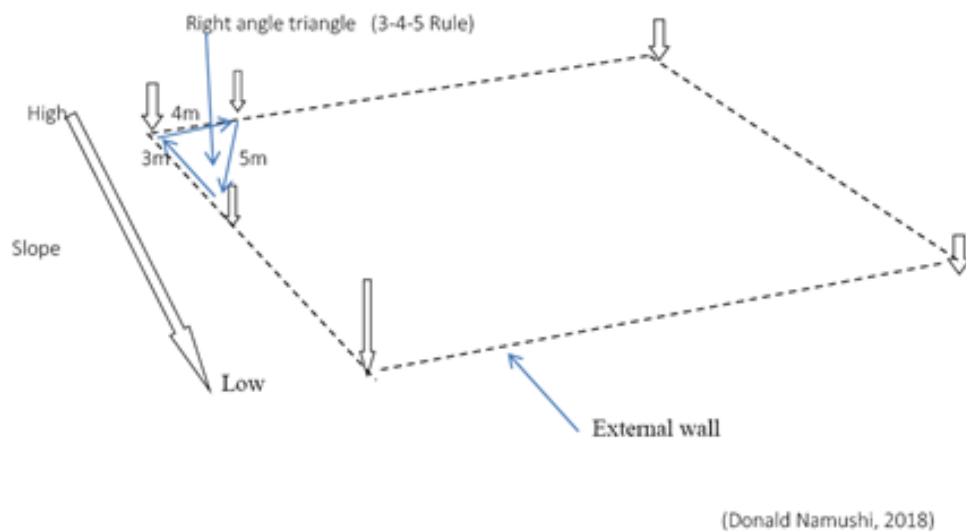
showing a stake external wall of a pond, sides aligned using a right angled triangle
